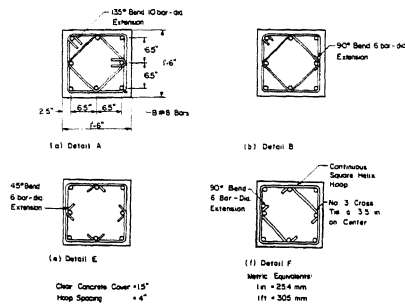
DETAILS OF TRANSVERSE REINFORCEMENT
